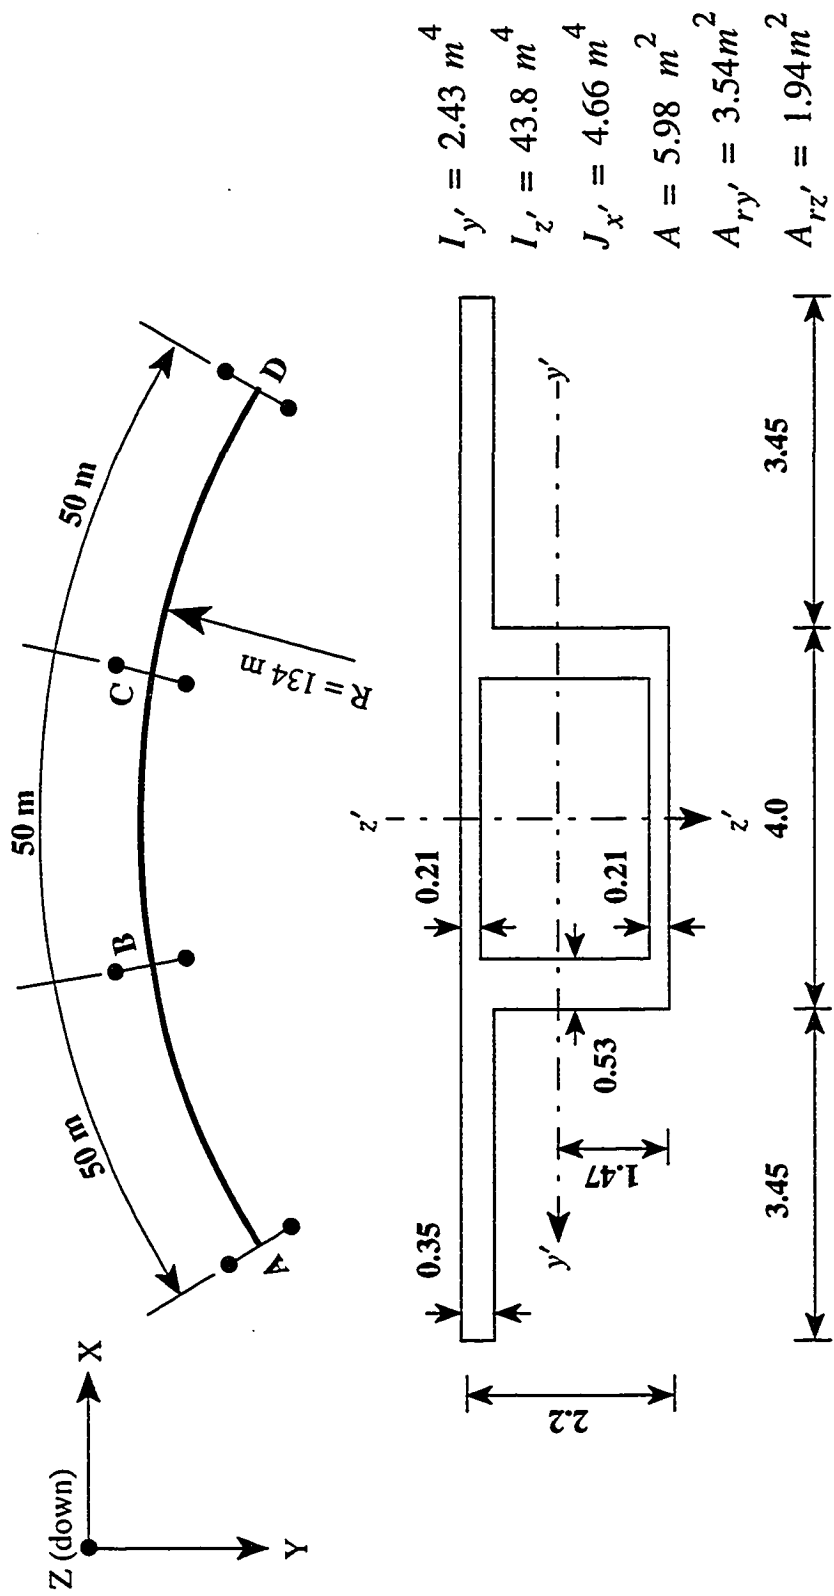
Three-Span Curved Bridge, Plan and Cross Sectional Dimensions
